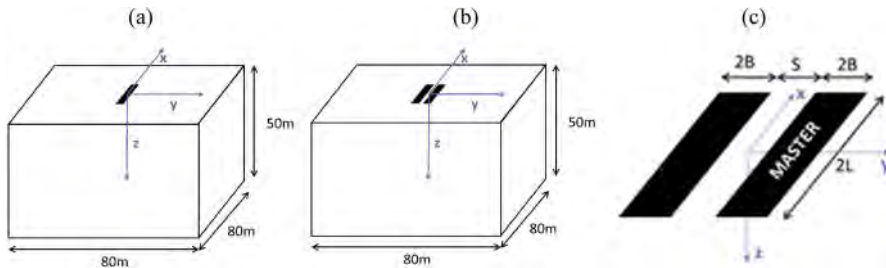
Reference schemes for the single footing (a) and the twin footings (b) on homogeneous half-space. Details of the two footings in (c).
